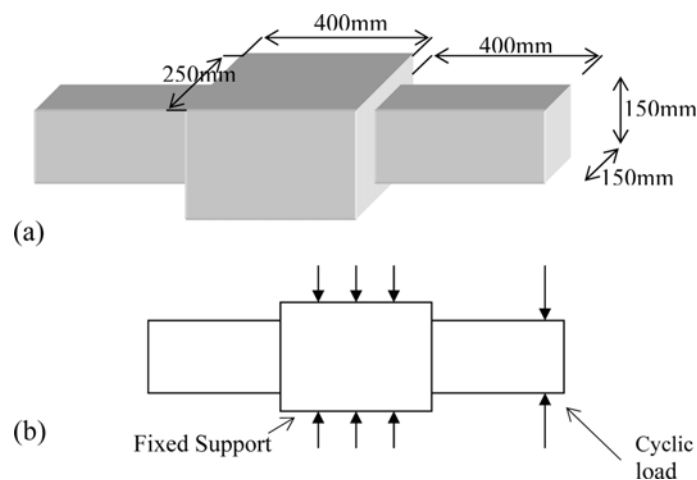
(a) Dimensions of original twin specimens and (b) Schematic test setup
